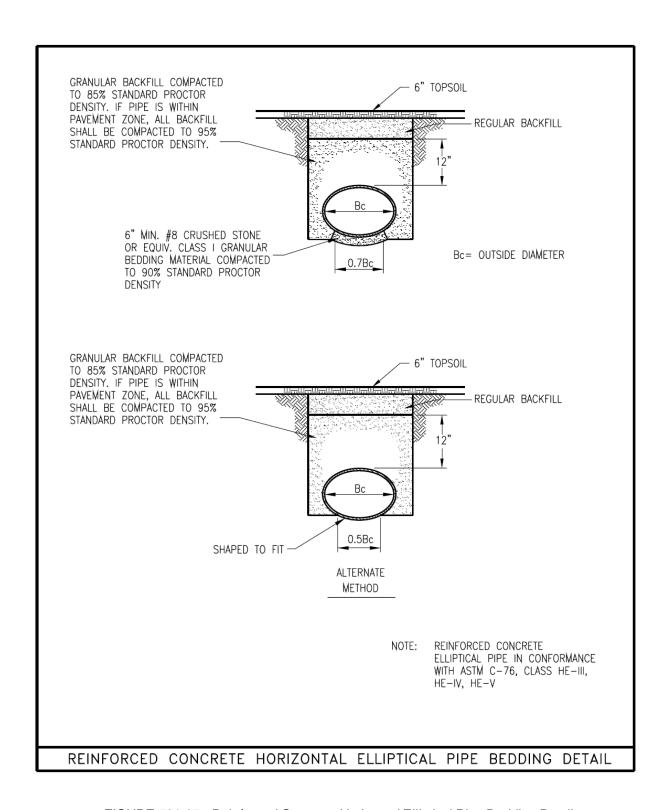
Reinforced Concrete Horizontal Elliptical Pipe Bedding Detail
